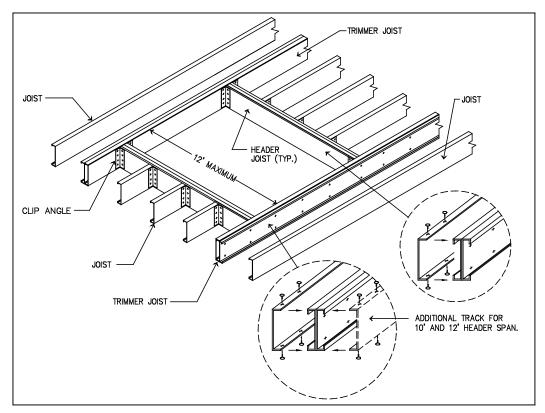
Twelve-Foot Floor Opening (Eight-Foot and Ten-Foot Similar)
